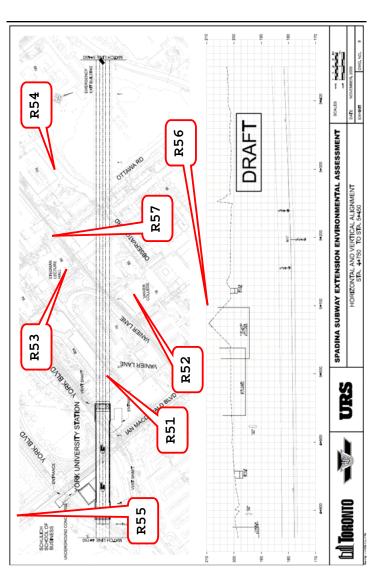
PLAN AND PROFILE OF THE PROPOSED SUBWAY ALIGNMENT
